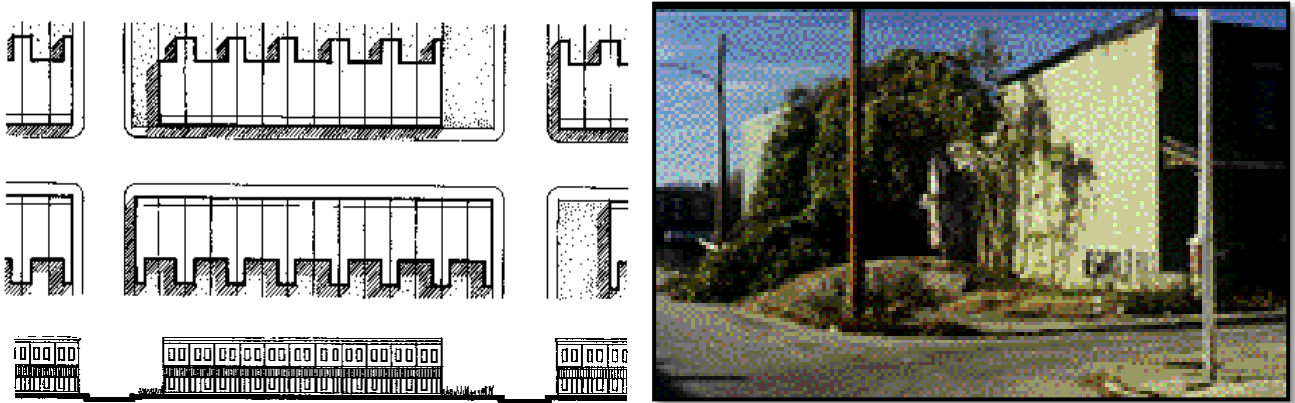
Picture and Plan showing Corner Lots Vacant Land
